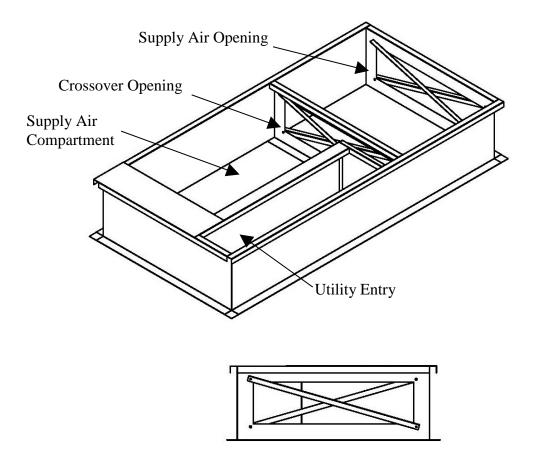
Acoustical Solid Bottom Curb with Horizontal Discharge Openings
